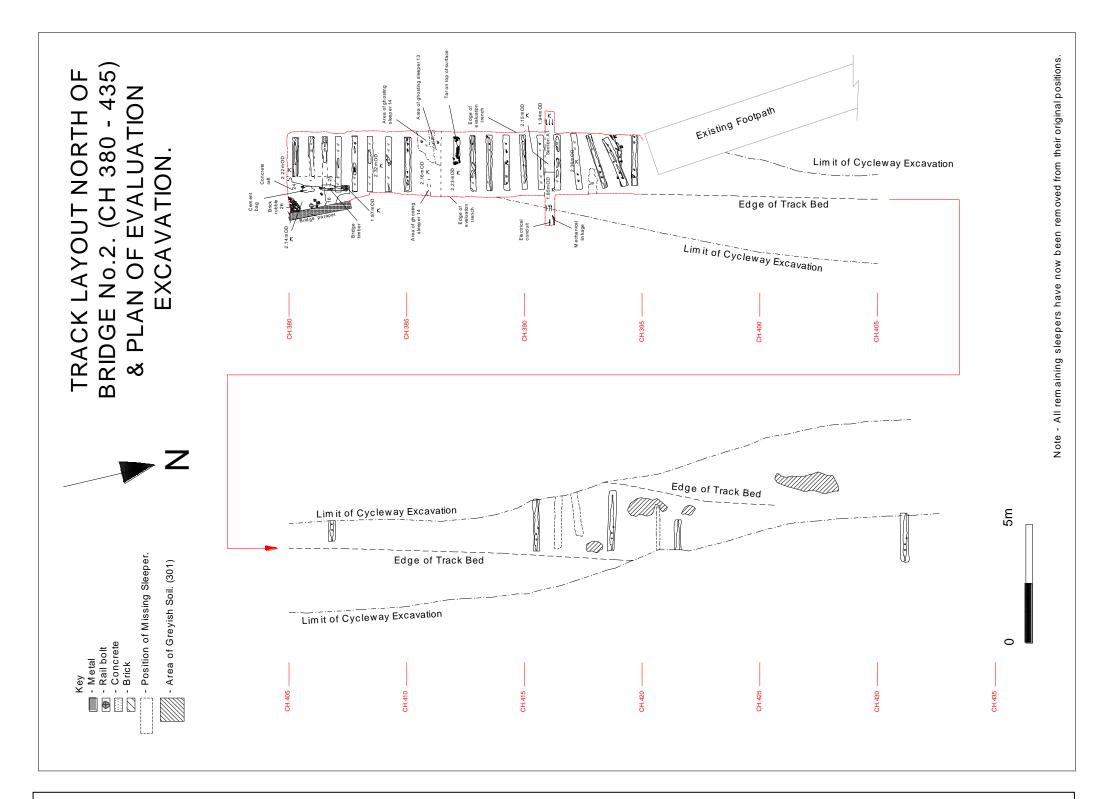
Eastbourne Cycleway – Plan of exposed Railway Sleepers to the North of Bridge No.2, including Plan of original evaluation excavation.
